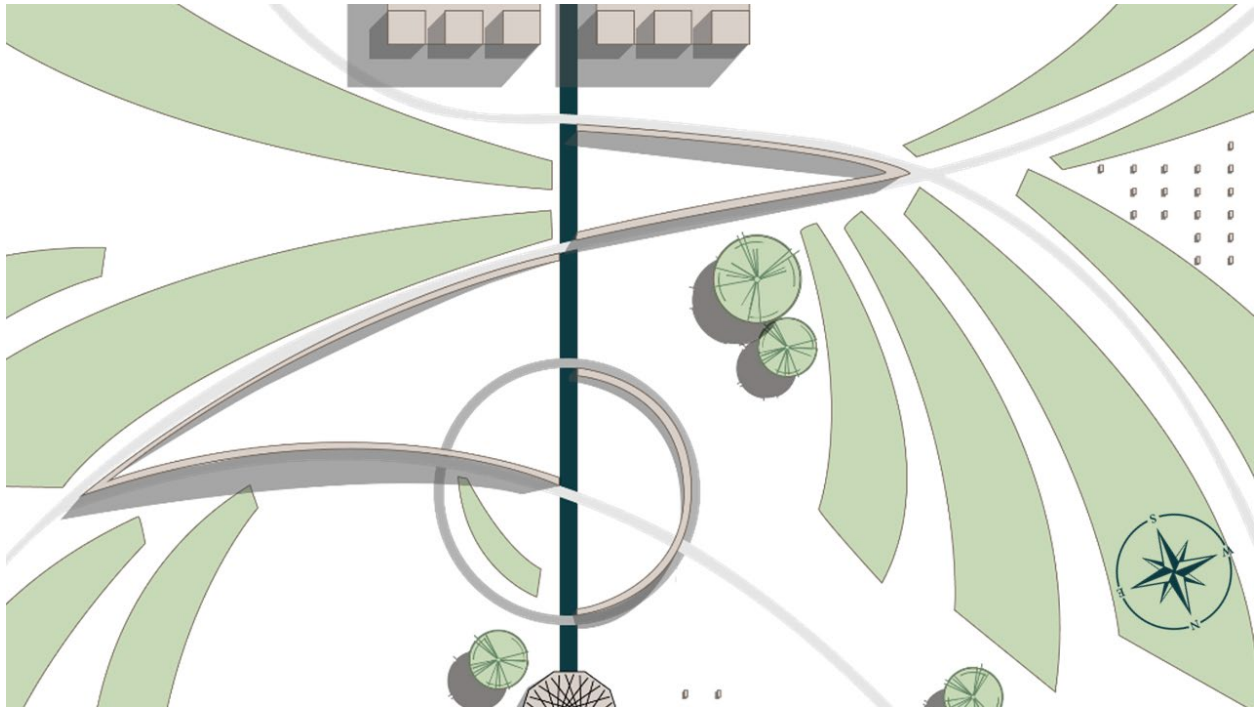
Landscape Memorial Procession Site Plan
